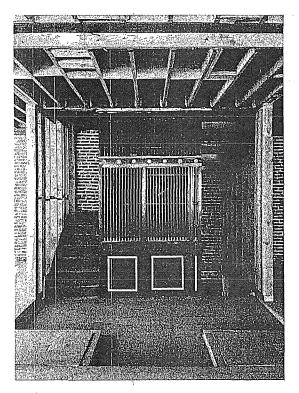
Detail view of stairs and elevator with ornamental metal cage at southern wall. Note differential settlement of elevator landing from the remainder of the building (photograph taken on 02/27/2018).
